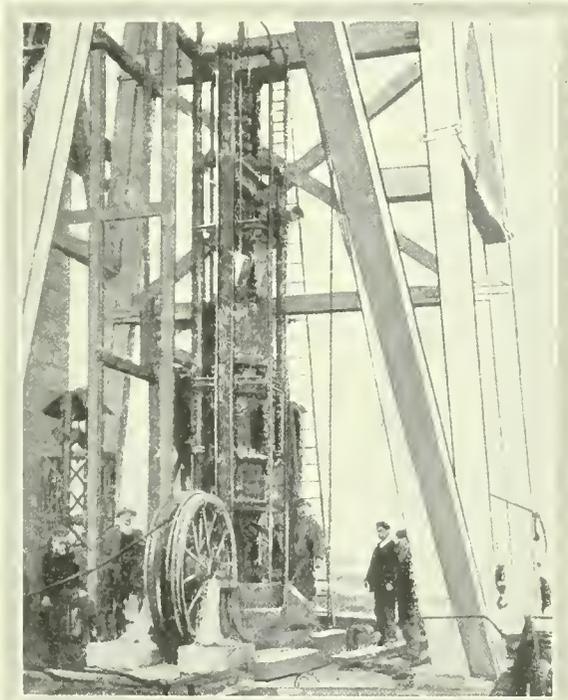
SINKING PUMP, HARVEY'S SHAFT
